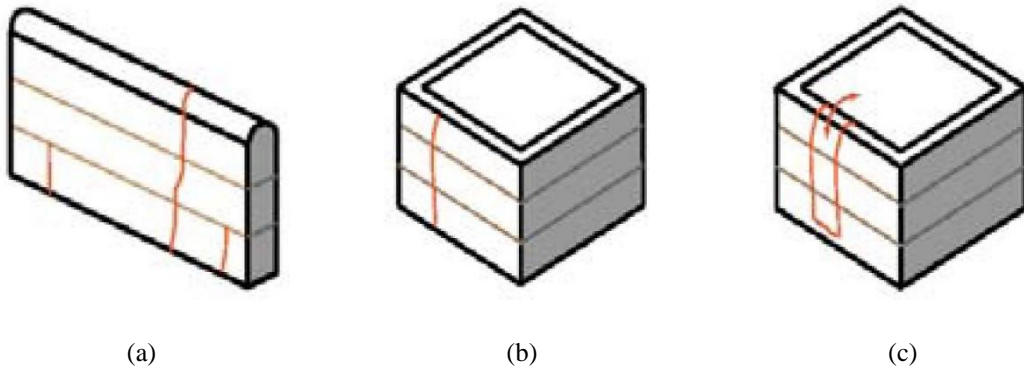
6. Out-of-plane typical damages observed in cob walls (NIKER, 2010).
